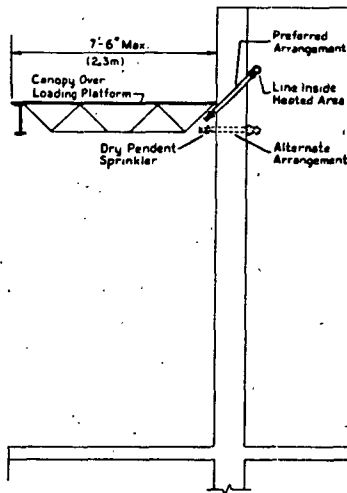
Dry Pendent Sprinklers for Protection of Covered Platforms, Shipping Docks, and Similar Areas.
